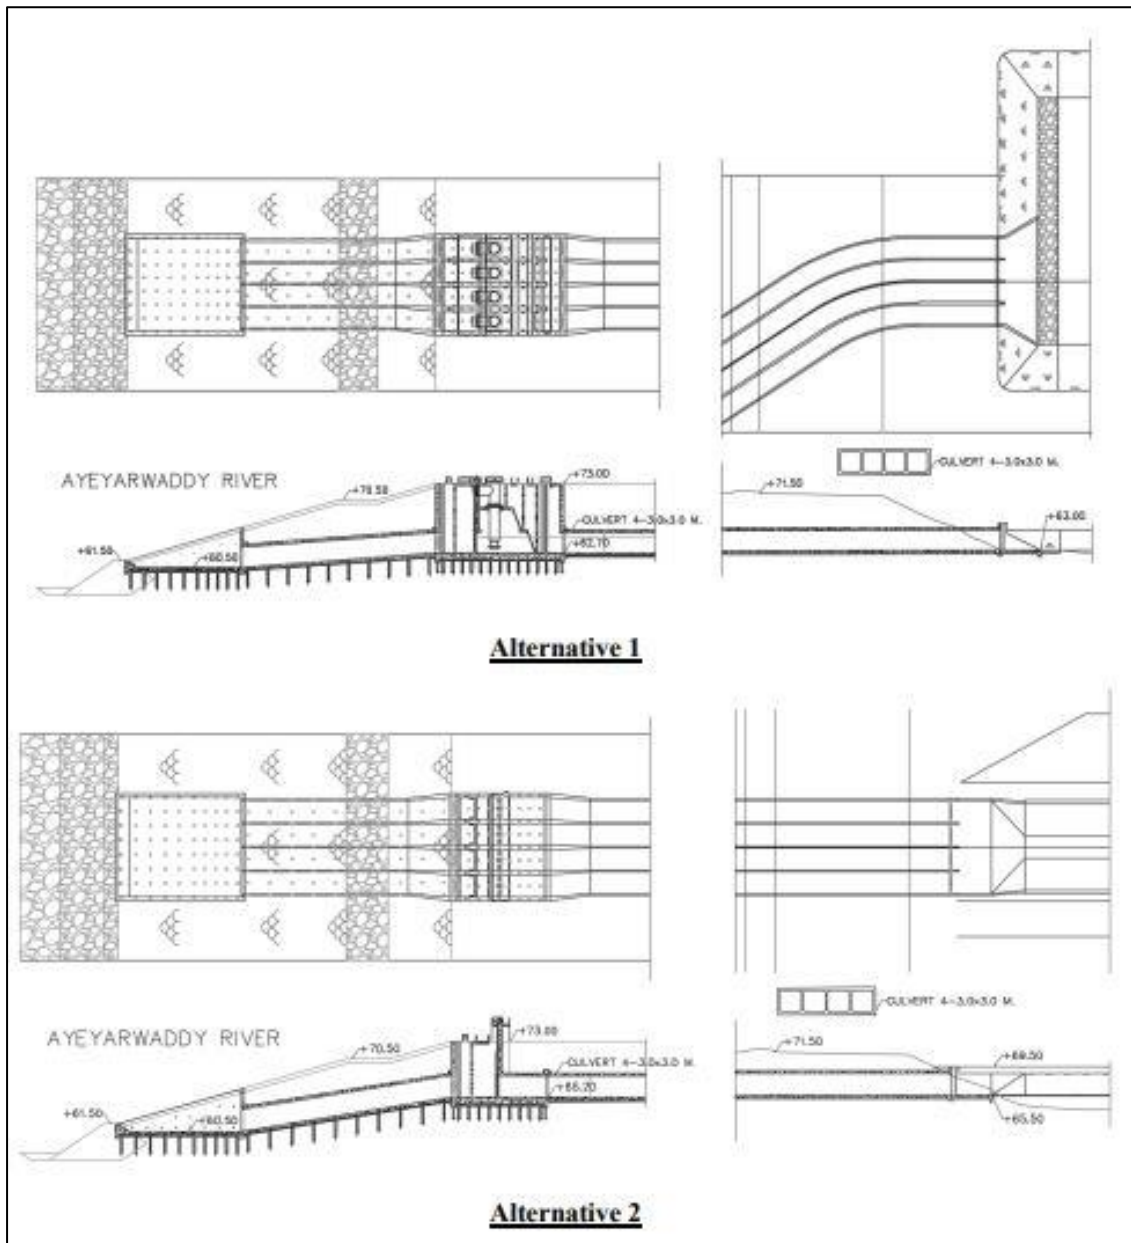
Typical Plan and Section of Main Drainage Connection
